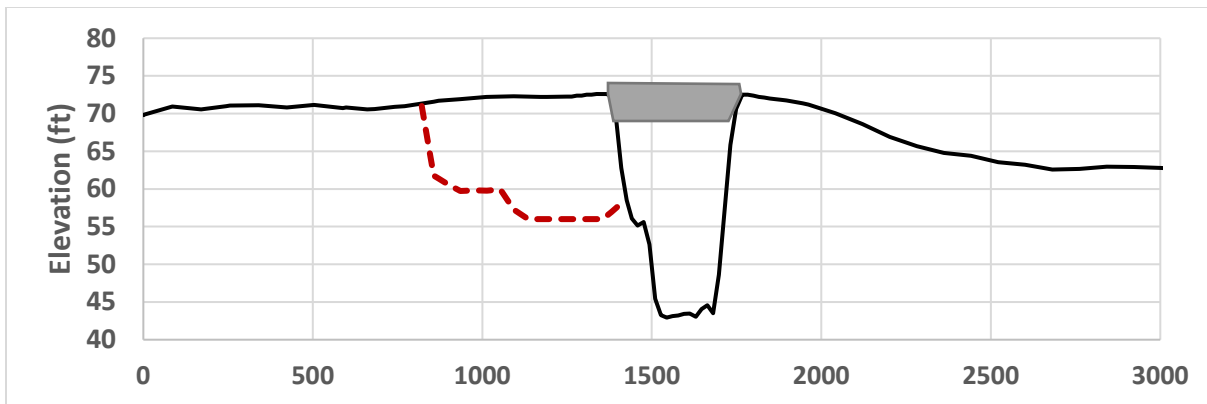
Cross section at Arrington Bridge Road showing existing (black line) and modified ground surface (dashed red line).
